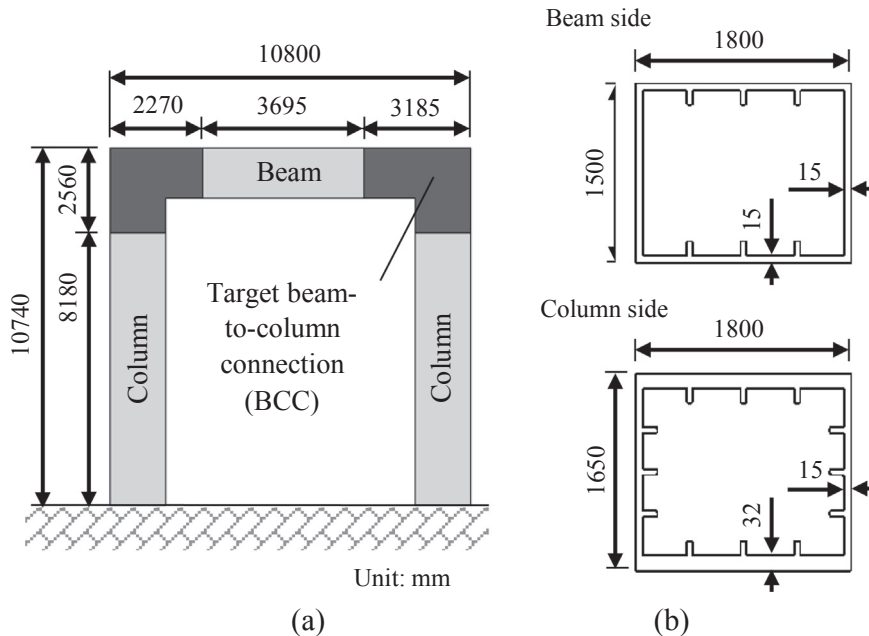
Target steel bridge pier: (a) whole view; (b) section of BCC.
